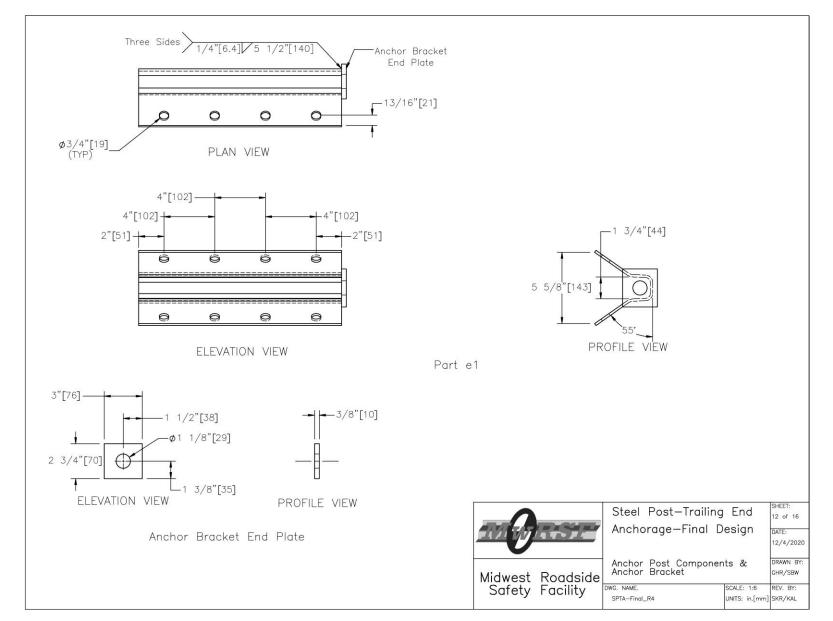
Steel-Post Trailing End Anchorage, Anchor Post Components and Anchor Bracket
